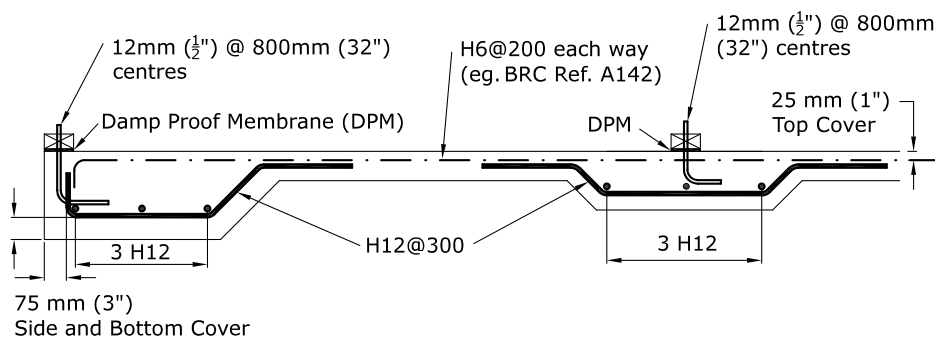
LAYOUT OF SLAB ON GROUND FOOTING
